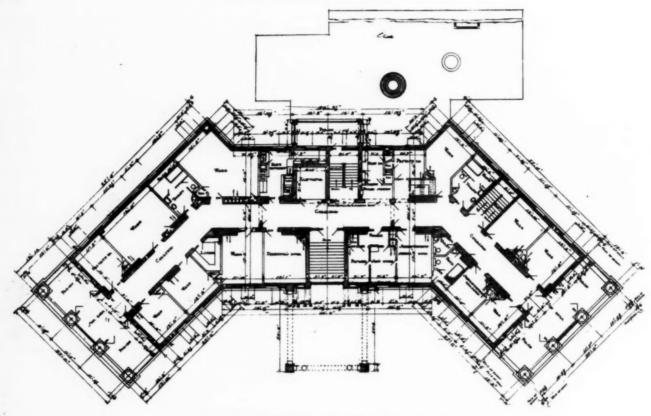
Edward W. Sparrow Hospital. First floor plan.
